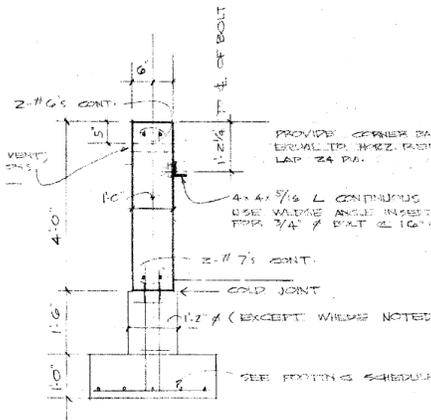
Section through Grade Beam, Pier and Footing from 1973 Construction Documents
